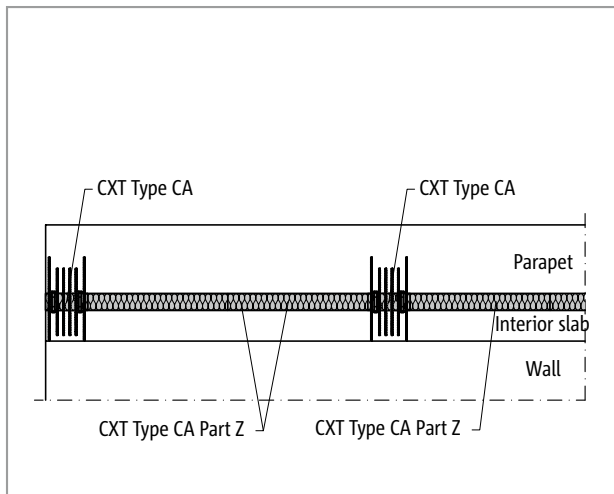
Schöck Isokorb® CXT Type CA and CXT Type CA Part Z: Curb
